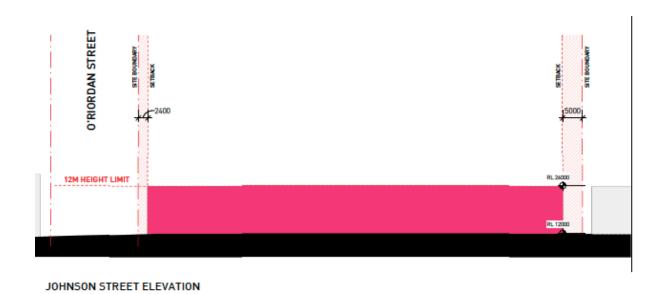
Proposed building envelope - Johnson Street (south) elevation
